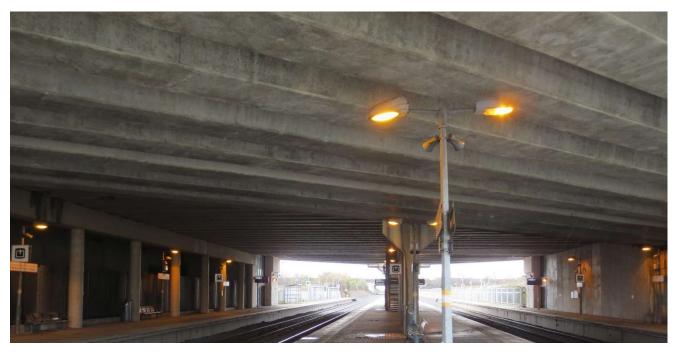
Park West Station Concourse Bridge (OBC9C) East Elevation
